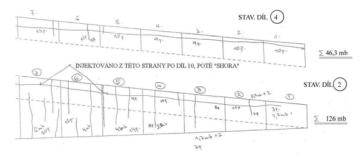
Technical record keeper of cracks on the internal face of the wall (cut)
